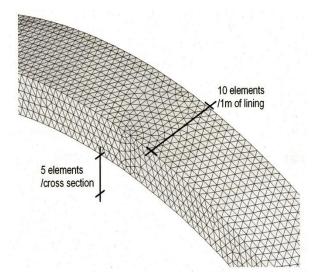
Detail of the 3-D finite element model of the tunnel final lining
